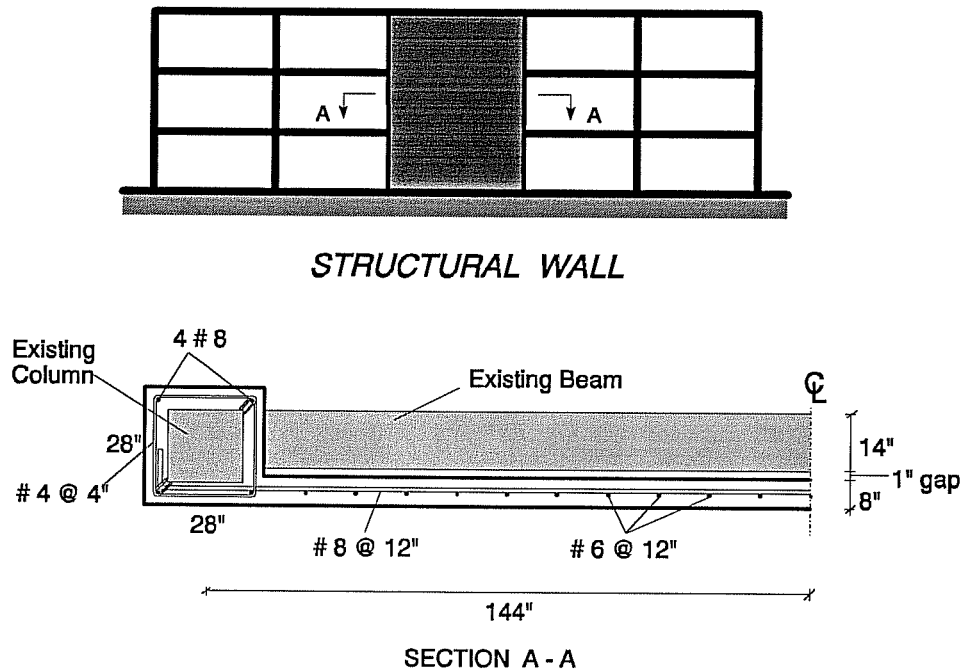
Cross section dimensions and reinforcing details of structural wall for the three-story building.
